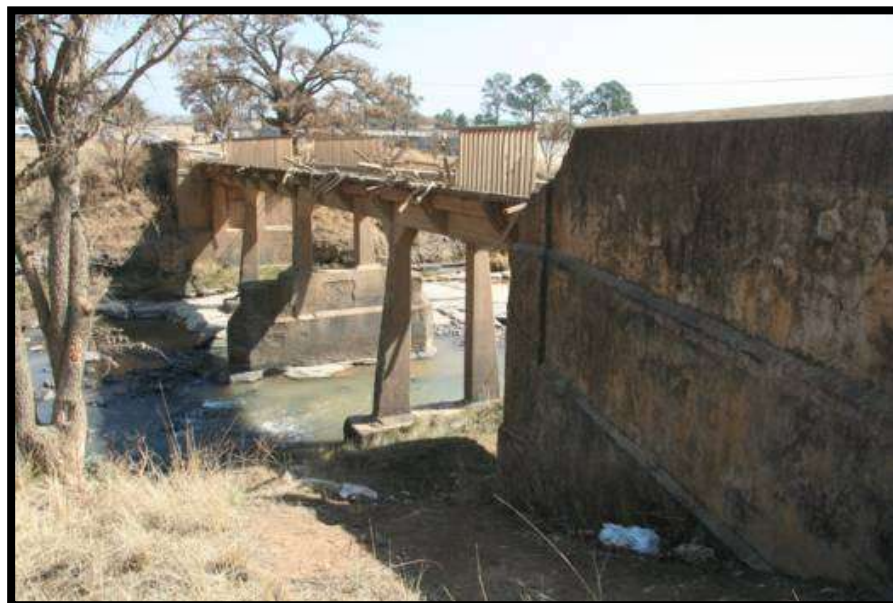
GENERAL VIEWS OF THE GOURTON BRIDGE FOUNDATIONS
